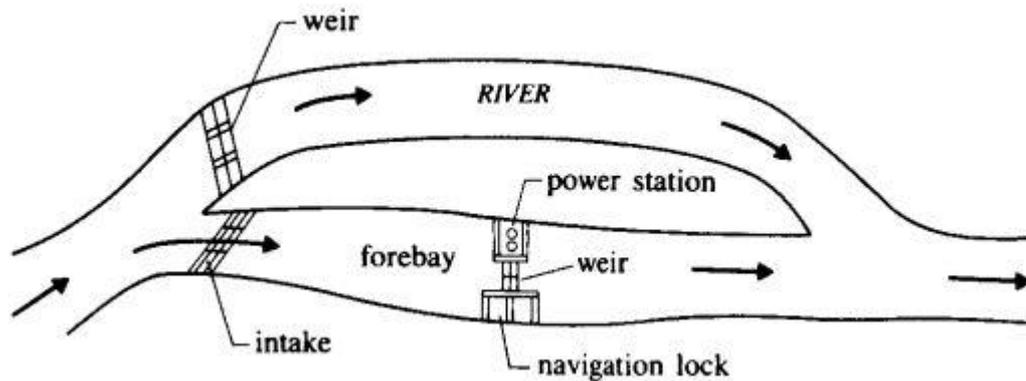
Typical Layout of a Diversion Canal Plant (P. Novak et al, 2004)
